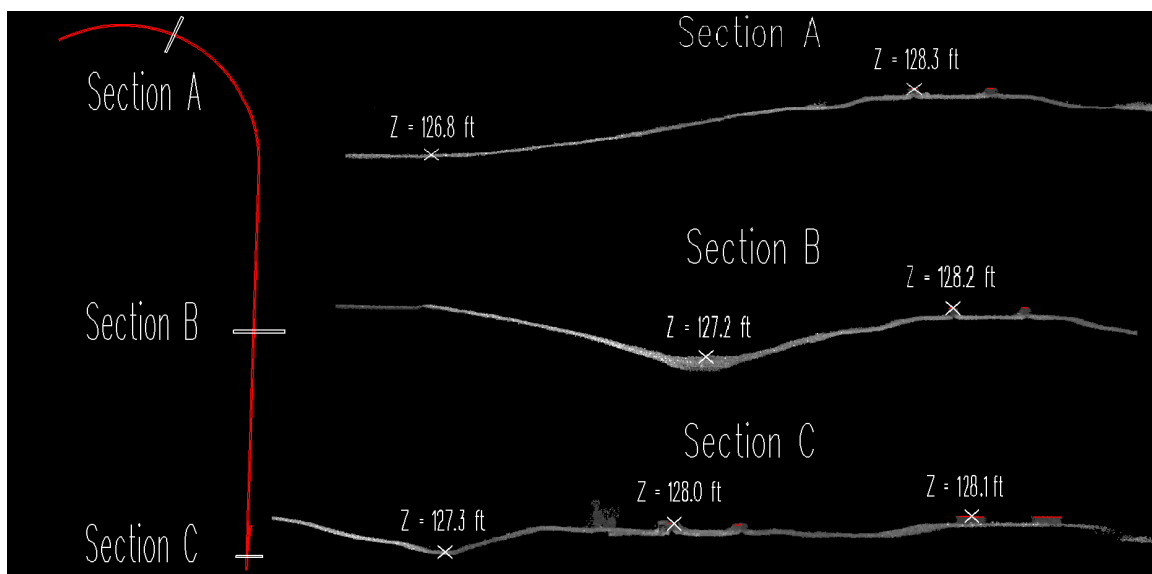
Cross-sections showing top rail elevation compared with lowest point along rail corridor.
